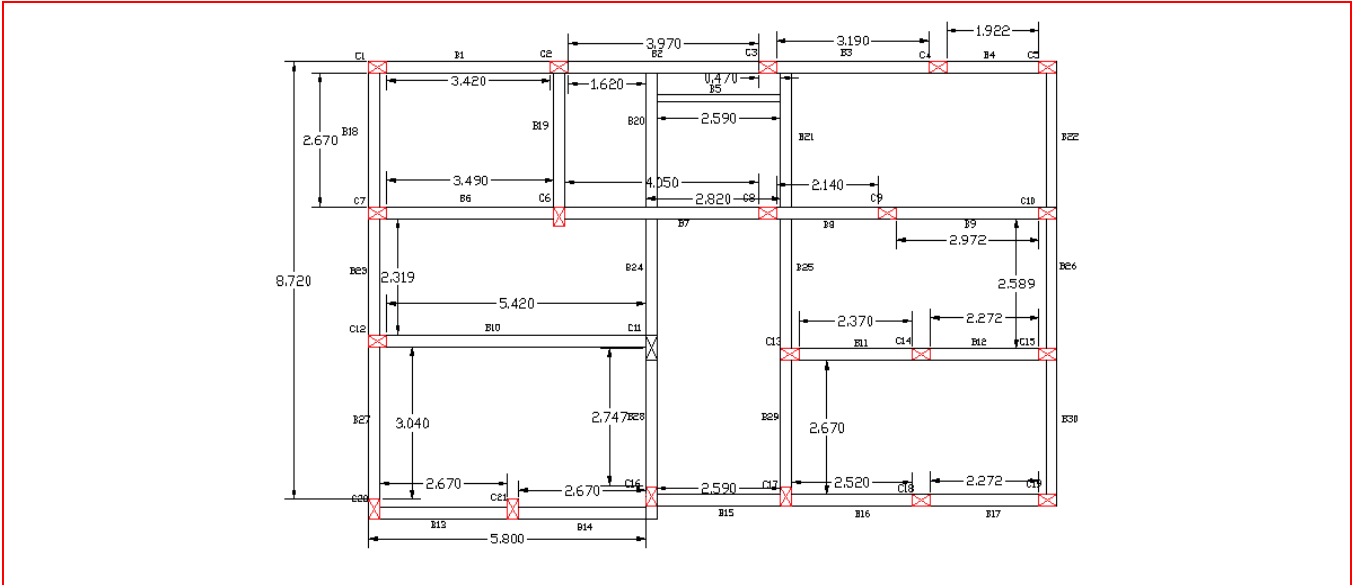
The plan of the three-storey RC building (Model-1) (units in m).
